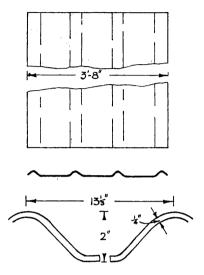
Typical form of angular-SECTION CORRUGATED ASBESTOS-CEMENT SHEET
